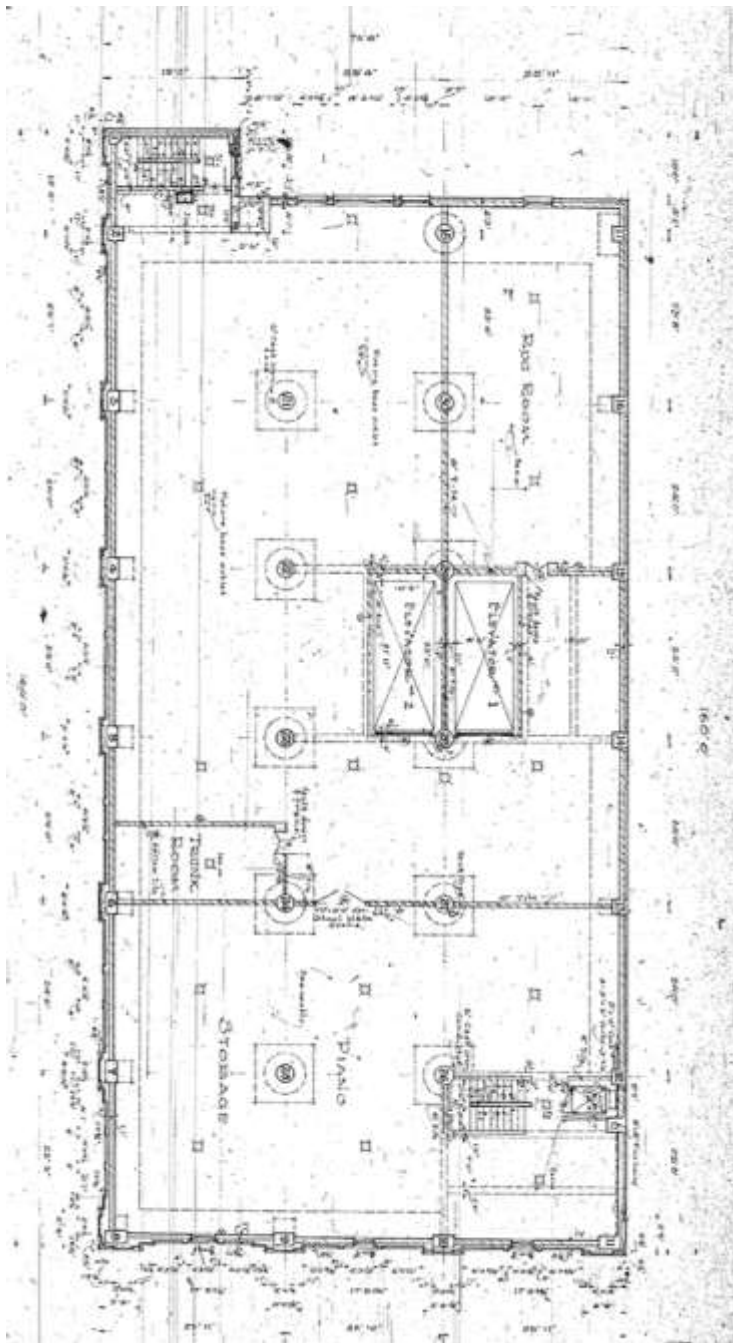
Historic Fourth Floor Plan. (Eschweiler & Eschweiler, 1928)
